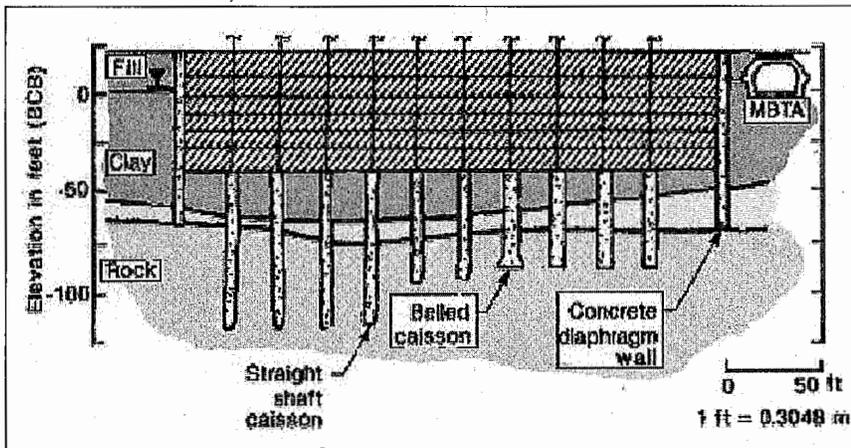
Section at the side of Post Office Square Garage showing lithology and slurry wall for up-down construction of seven sub-floors. (Courtesy of Deep Excavations, LLC.)
